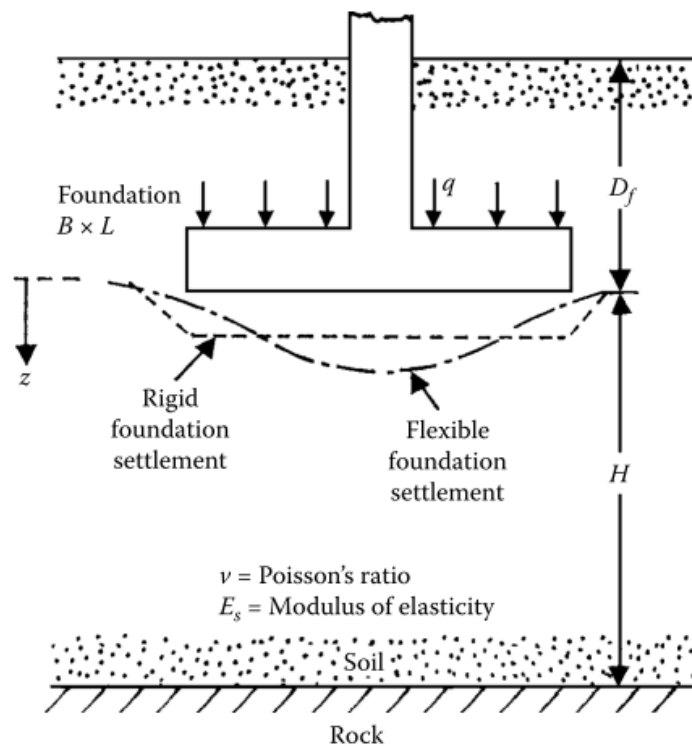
Settlement profile for shallow flexible and rigid foundations(Das 2009).
